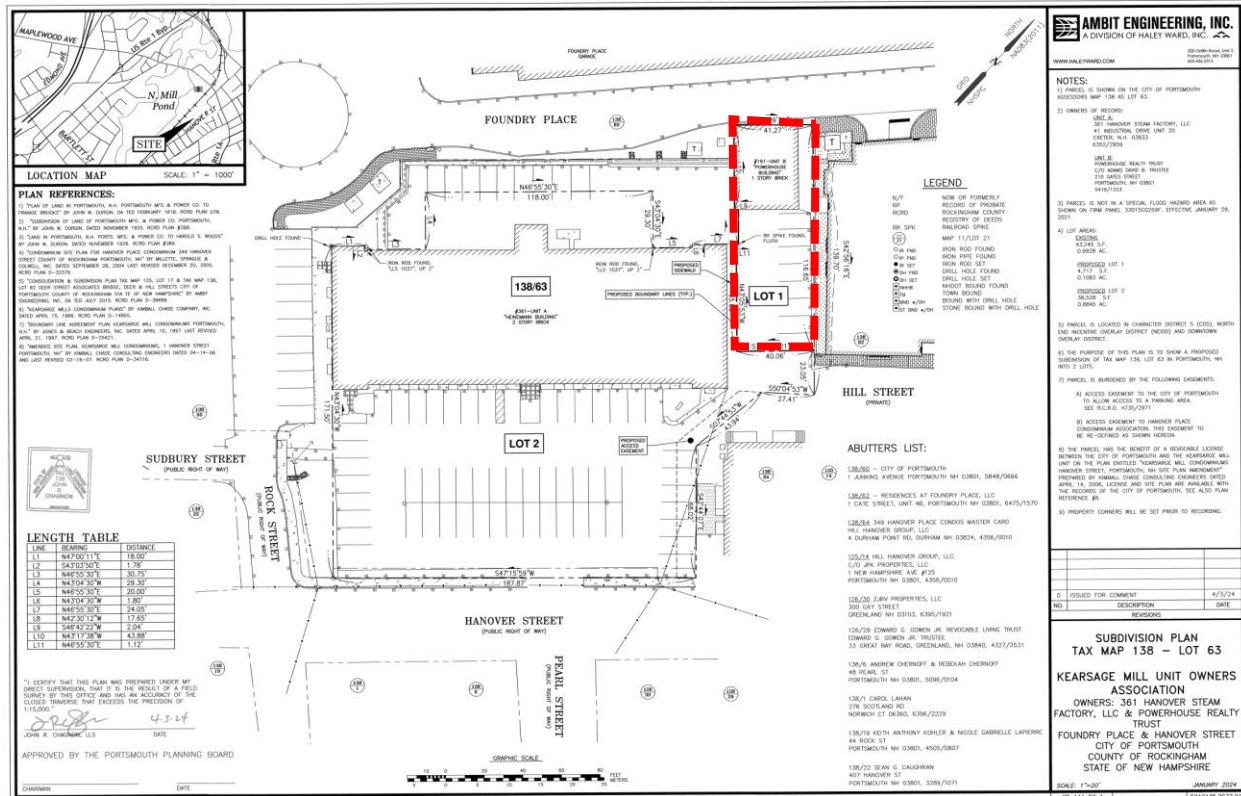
Proposed Subdivision Plan for the Powerhouse Building/“Adams” Parcel (4,717 SF)
